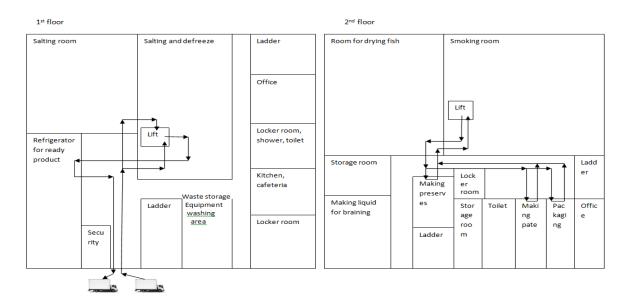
Floor plan of Site 4 (arrows show the flow of operation)
